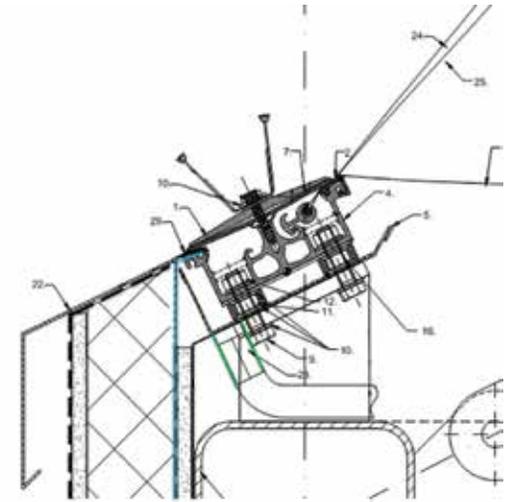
Revised ETFE system with internal drainage (green line) and air barrier detail (blue line). (Imported from ETFE manufacturer's shop drawings¹.)
